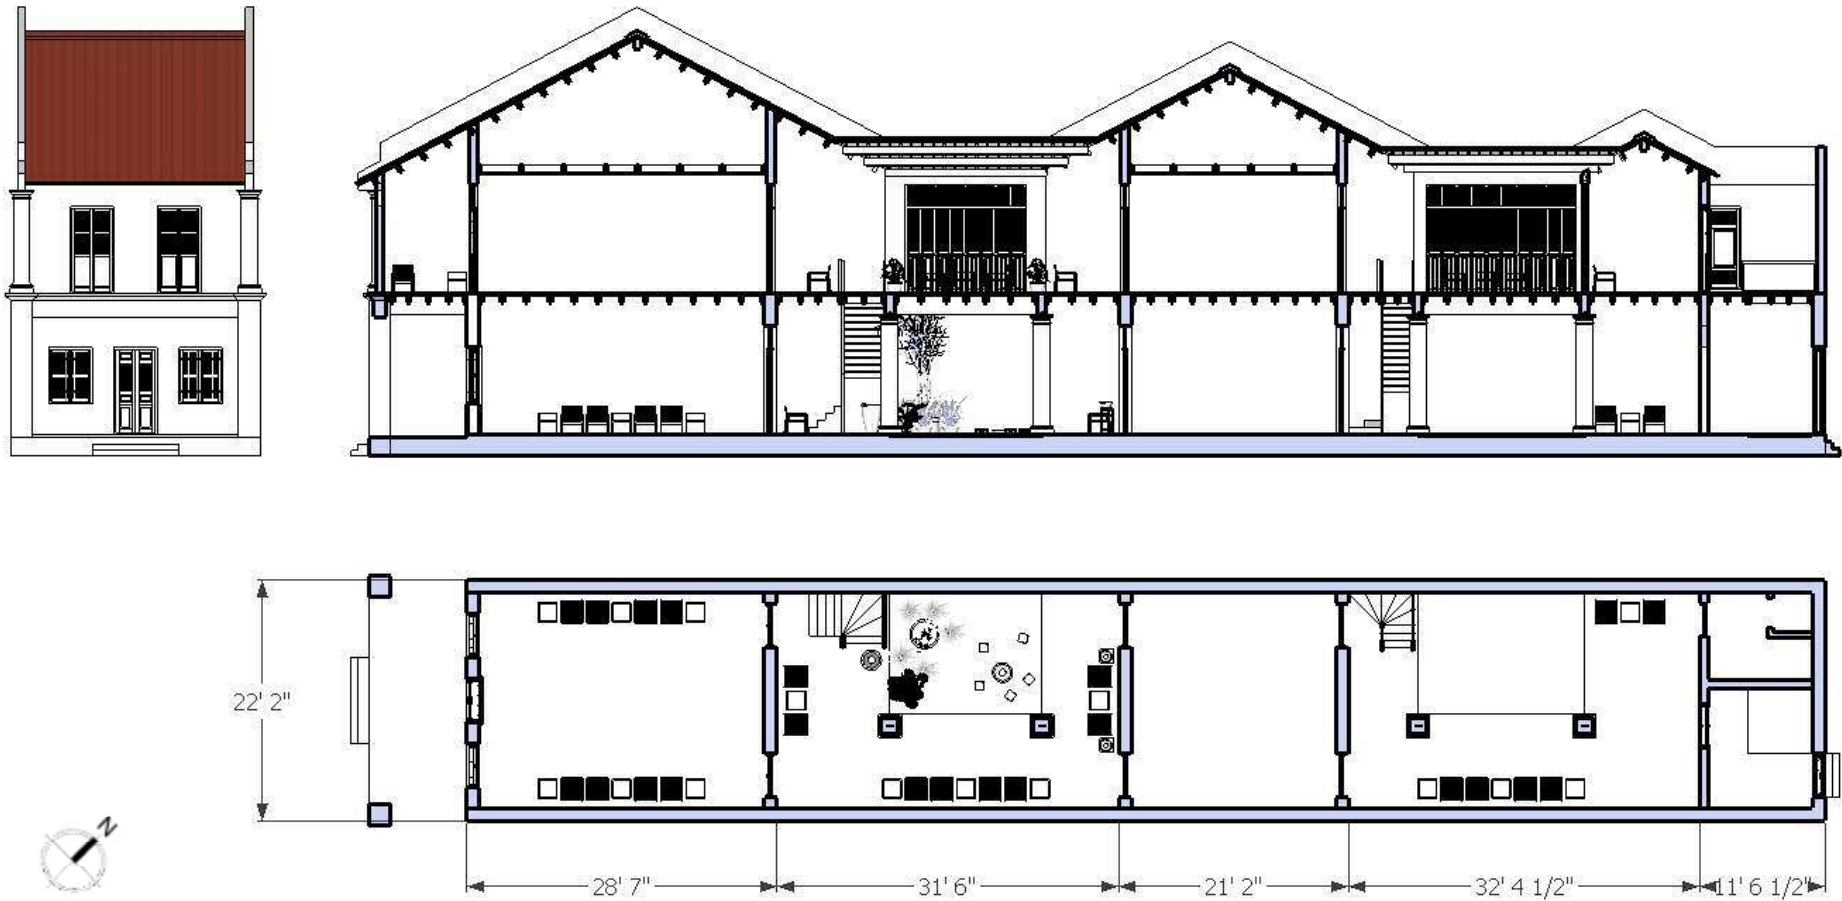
B: General plans of double-storey shophouse at George Town of Penang, Malaysia. (Not to scale drawings)
